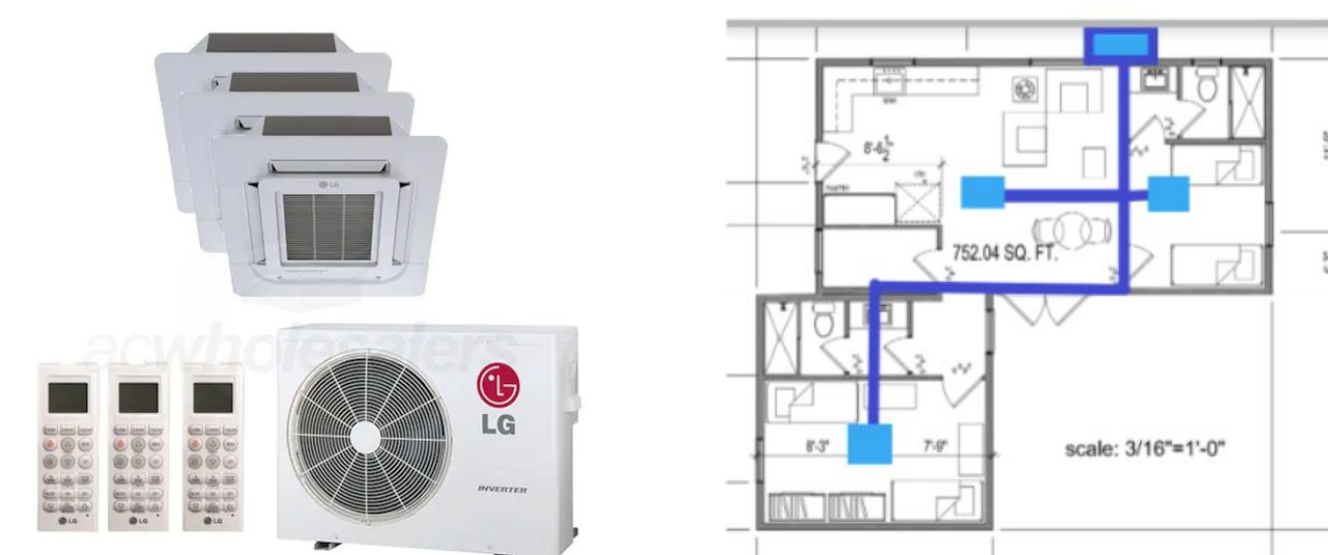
Heating Cooling Schematic (Left)-LG Ceiling Cassettes 3-Zone System (Right)-3 Zone locations with ADU floor plan
